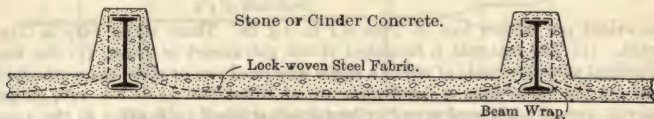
Concrete Ceiling-slab Reinforced with Lock-woven Fabric
